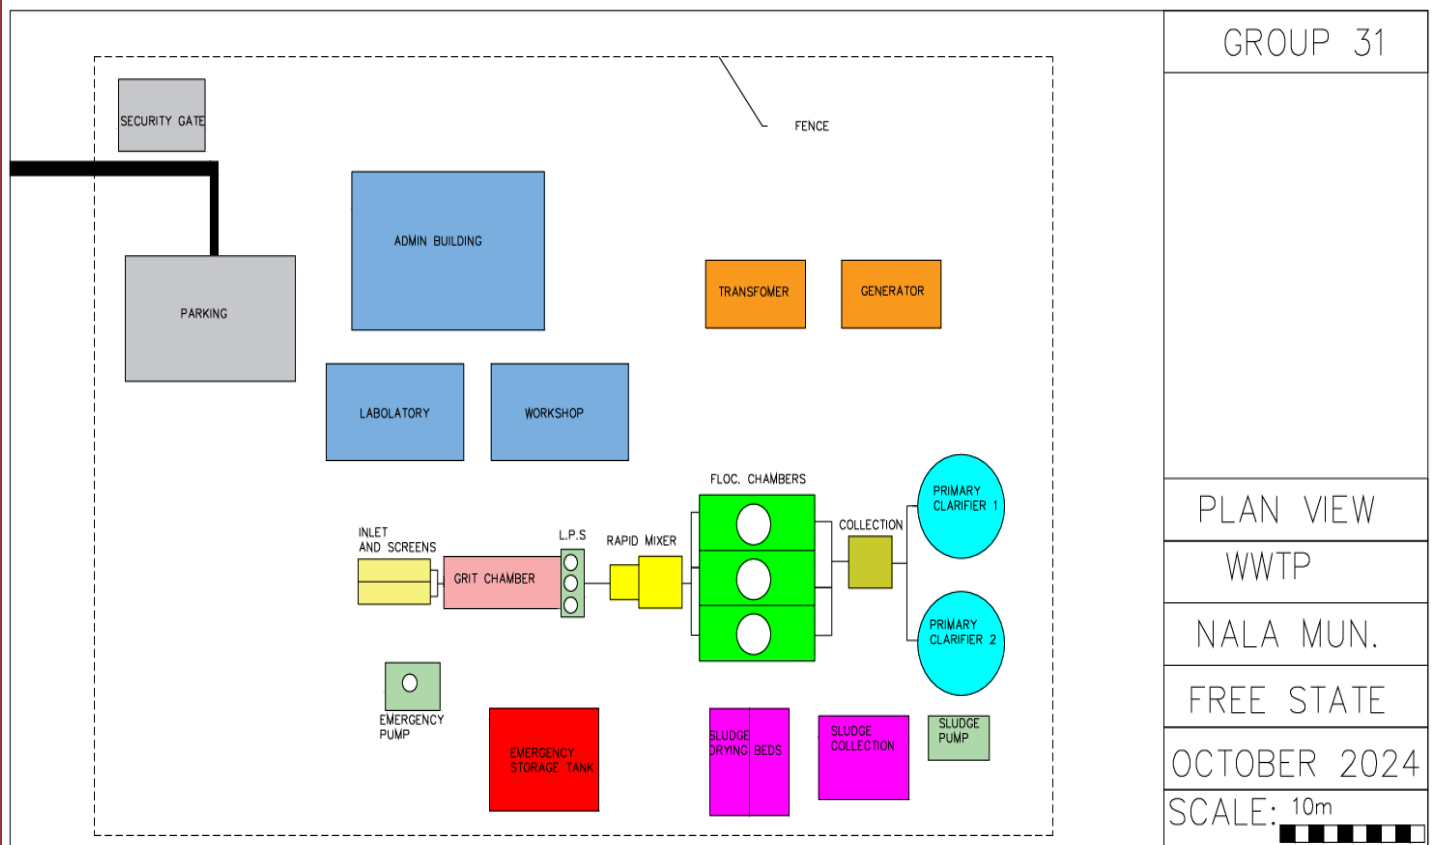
PLAN VIEW OF THE WWTP LAYOUT
